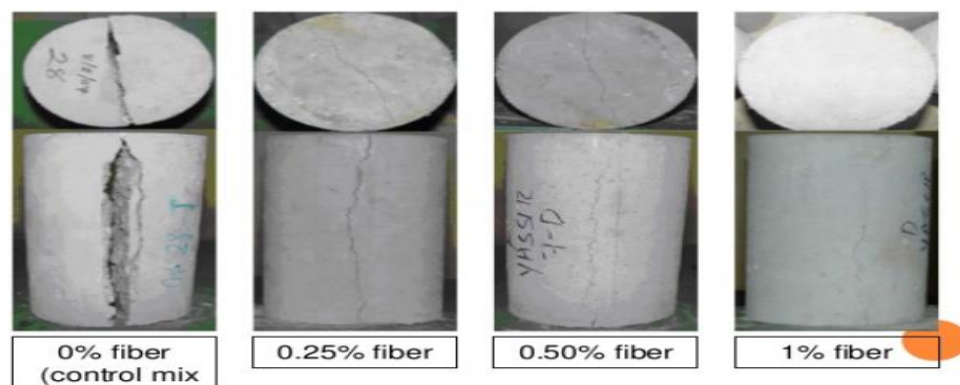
Mechanism of failure of concrete cylinder under splitting tensile test
